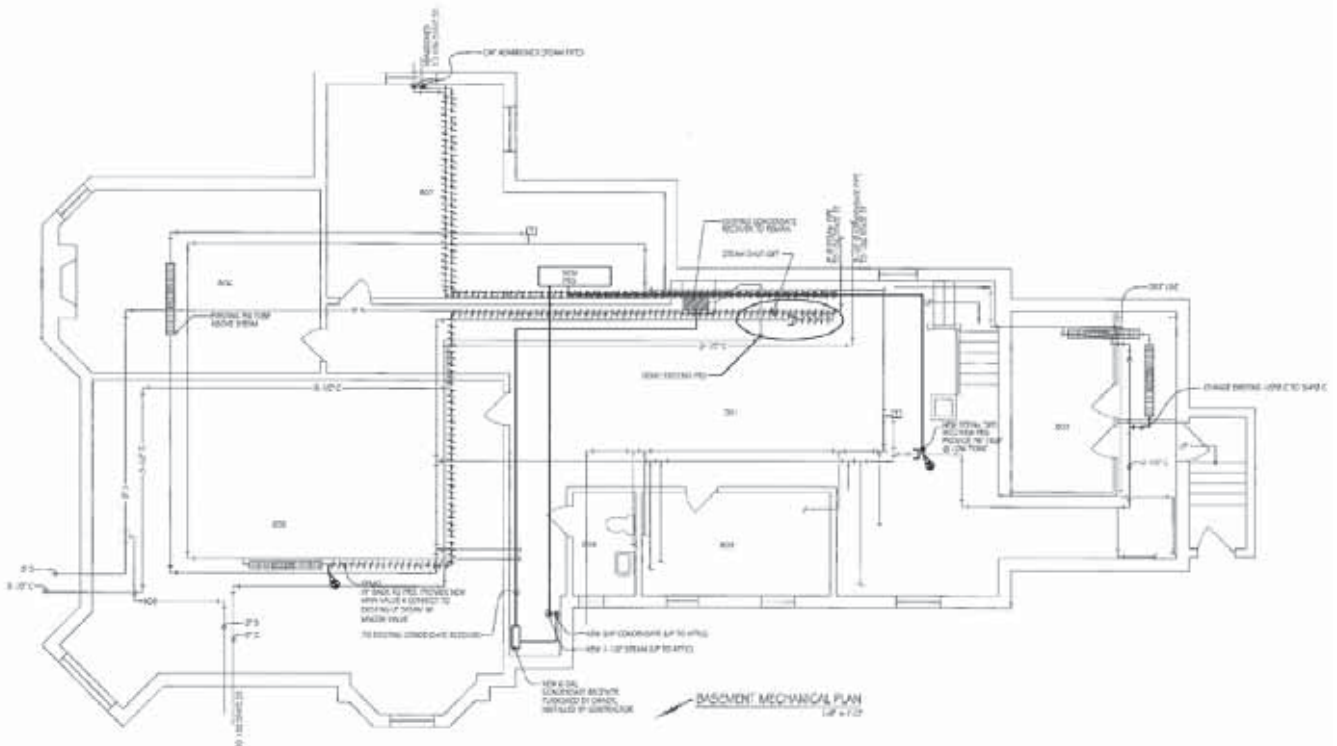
Basement plan from September 2010 Mechanical Renovation plans, Sheet M-1 (N.T.S.)
